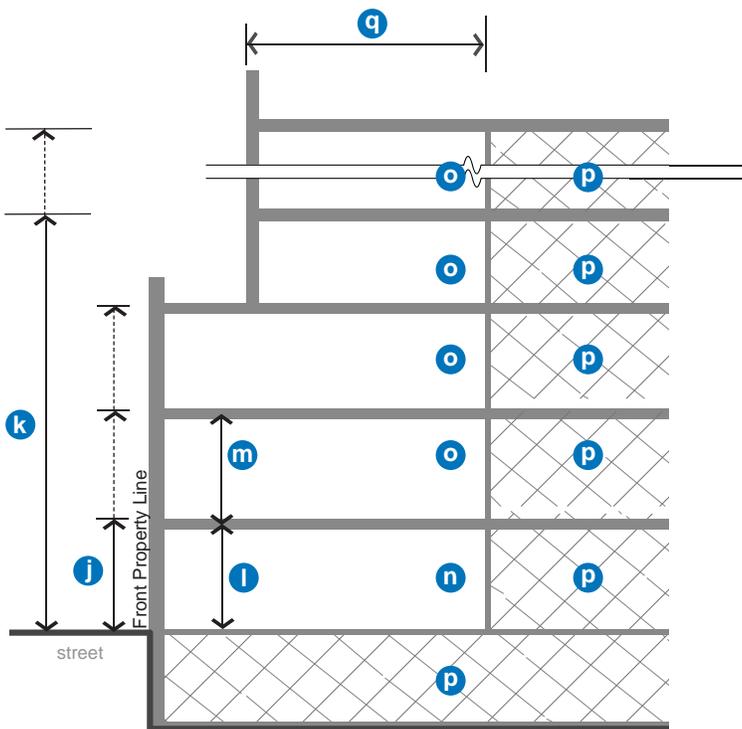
(2). Storefront Building: Height & Use Requirements.
